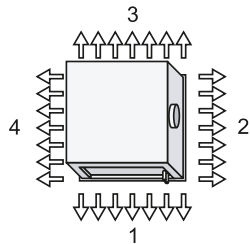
Top view of nozzle setting for a single-module unit, sides 1-4.
